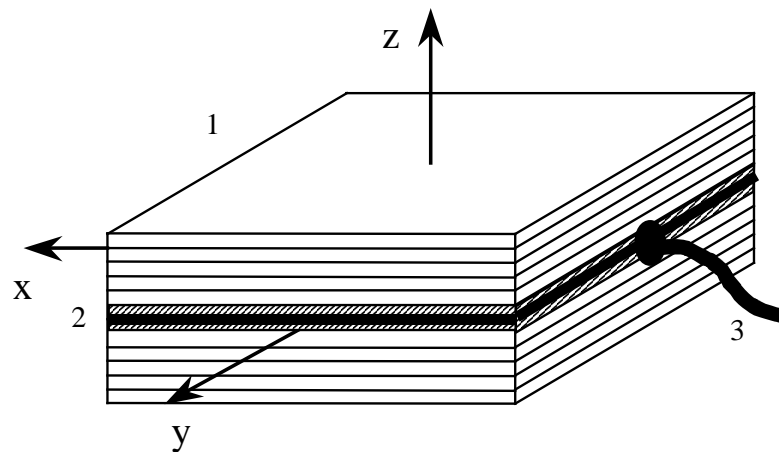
Schematic diagram of the prototype force-sensitive bearing showing (1) conventional laminated rubber bearing material, (2) a sheet of piezoelectric material between two aluminium plates and (3) a cable to carry the charge signal.
